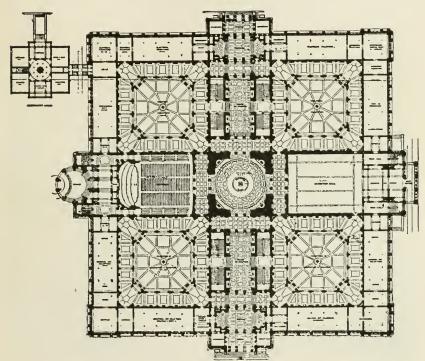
Brooklyn Institute of Arts and Sciences. Plan of first floor of the projected building.
